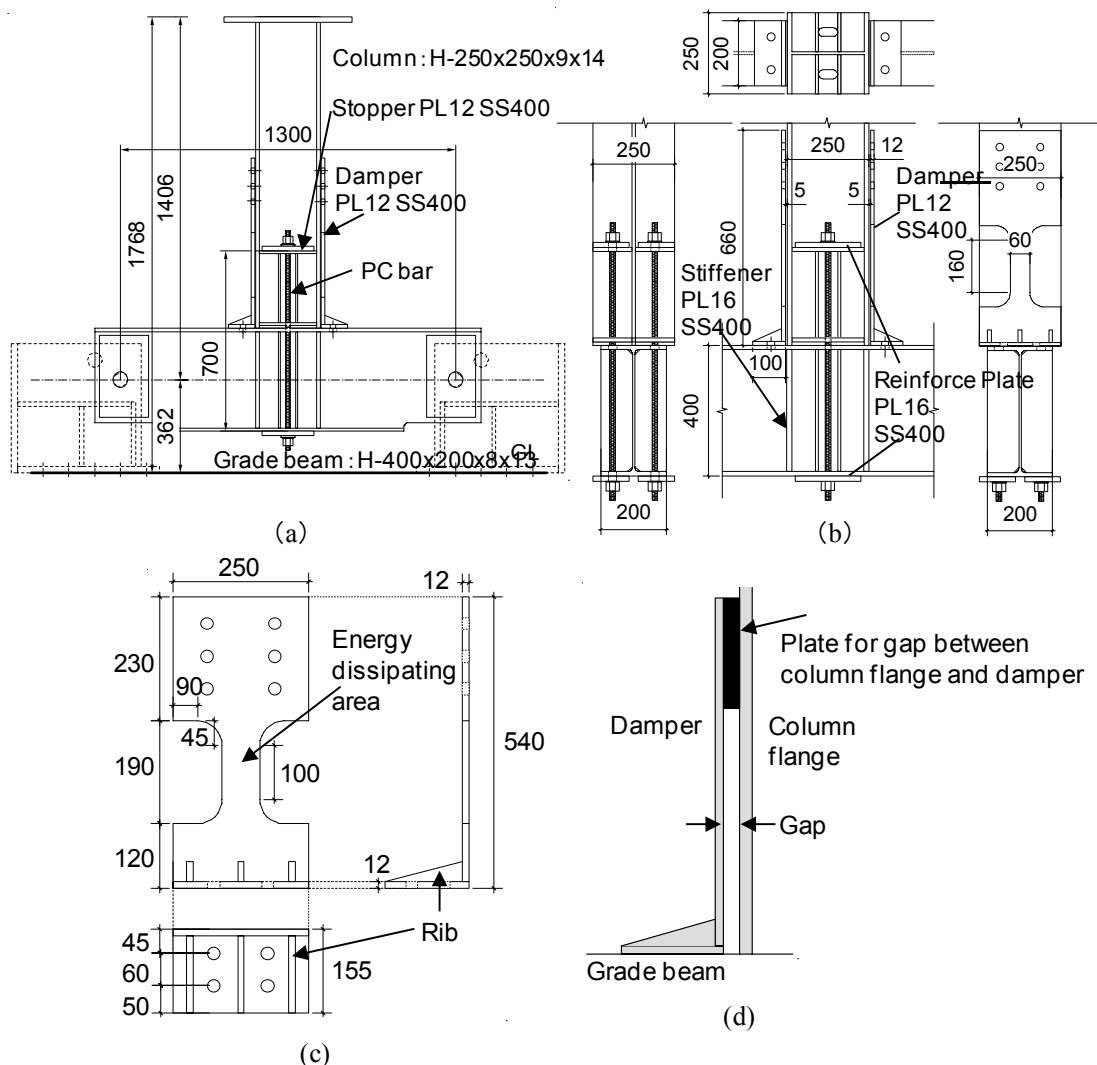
SC column base specimen: (a) General view; (b) Connection detail; (c) Damper; (d) Position of damper
